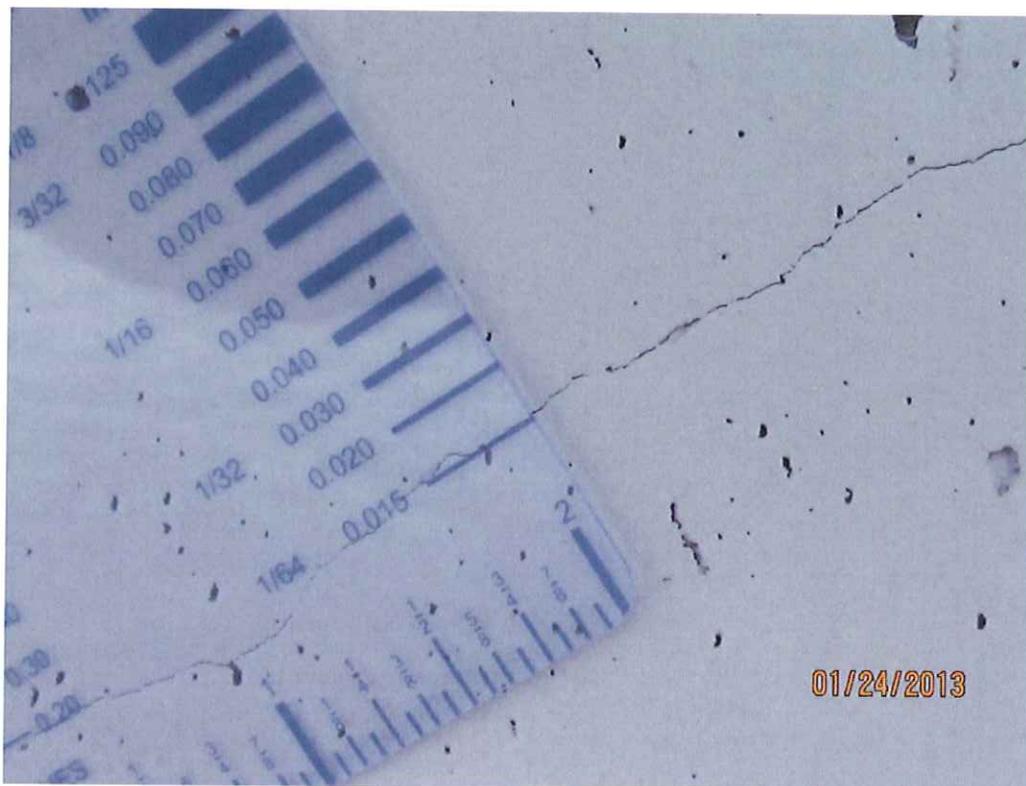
Typical width of diagonal/shear cracks in beams
